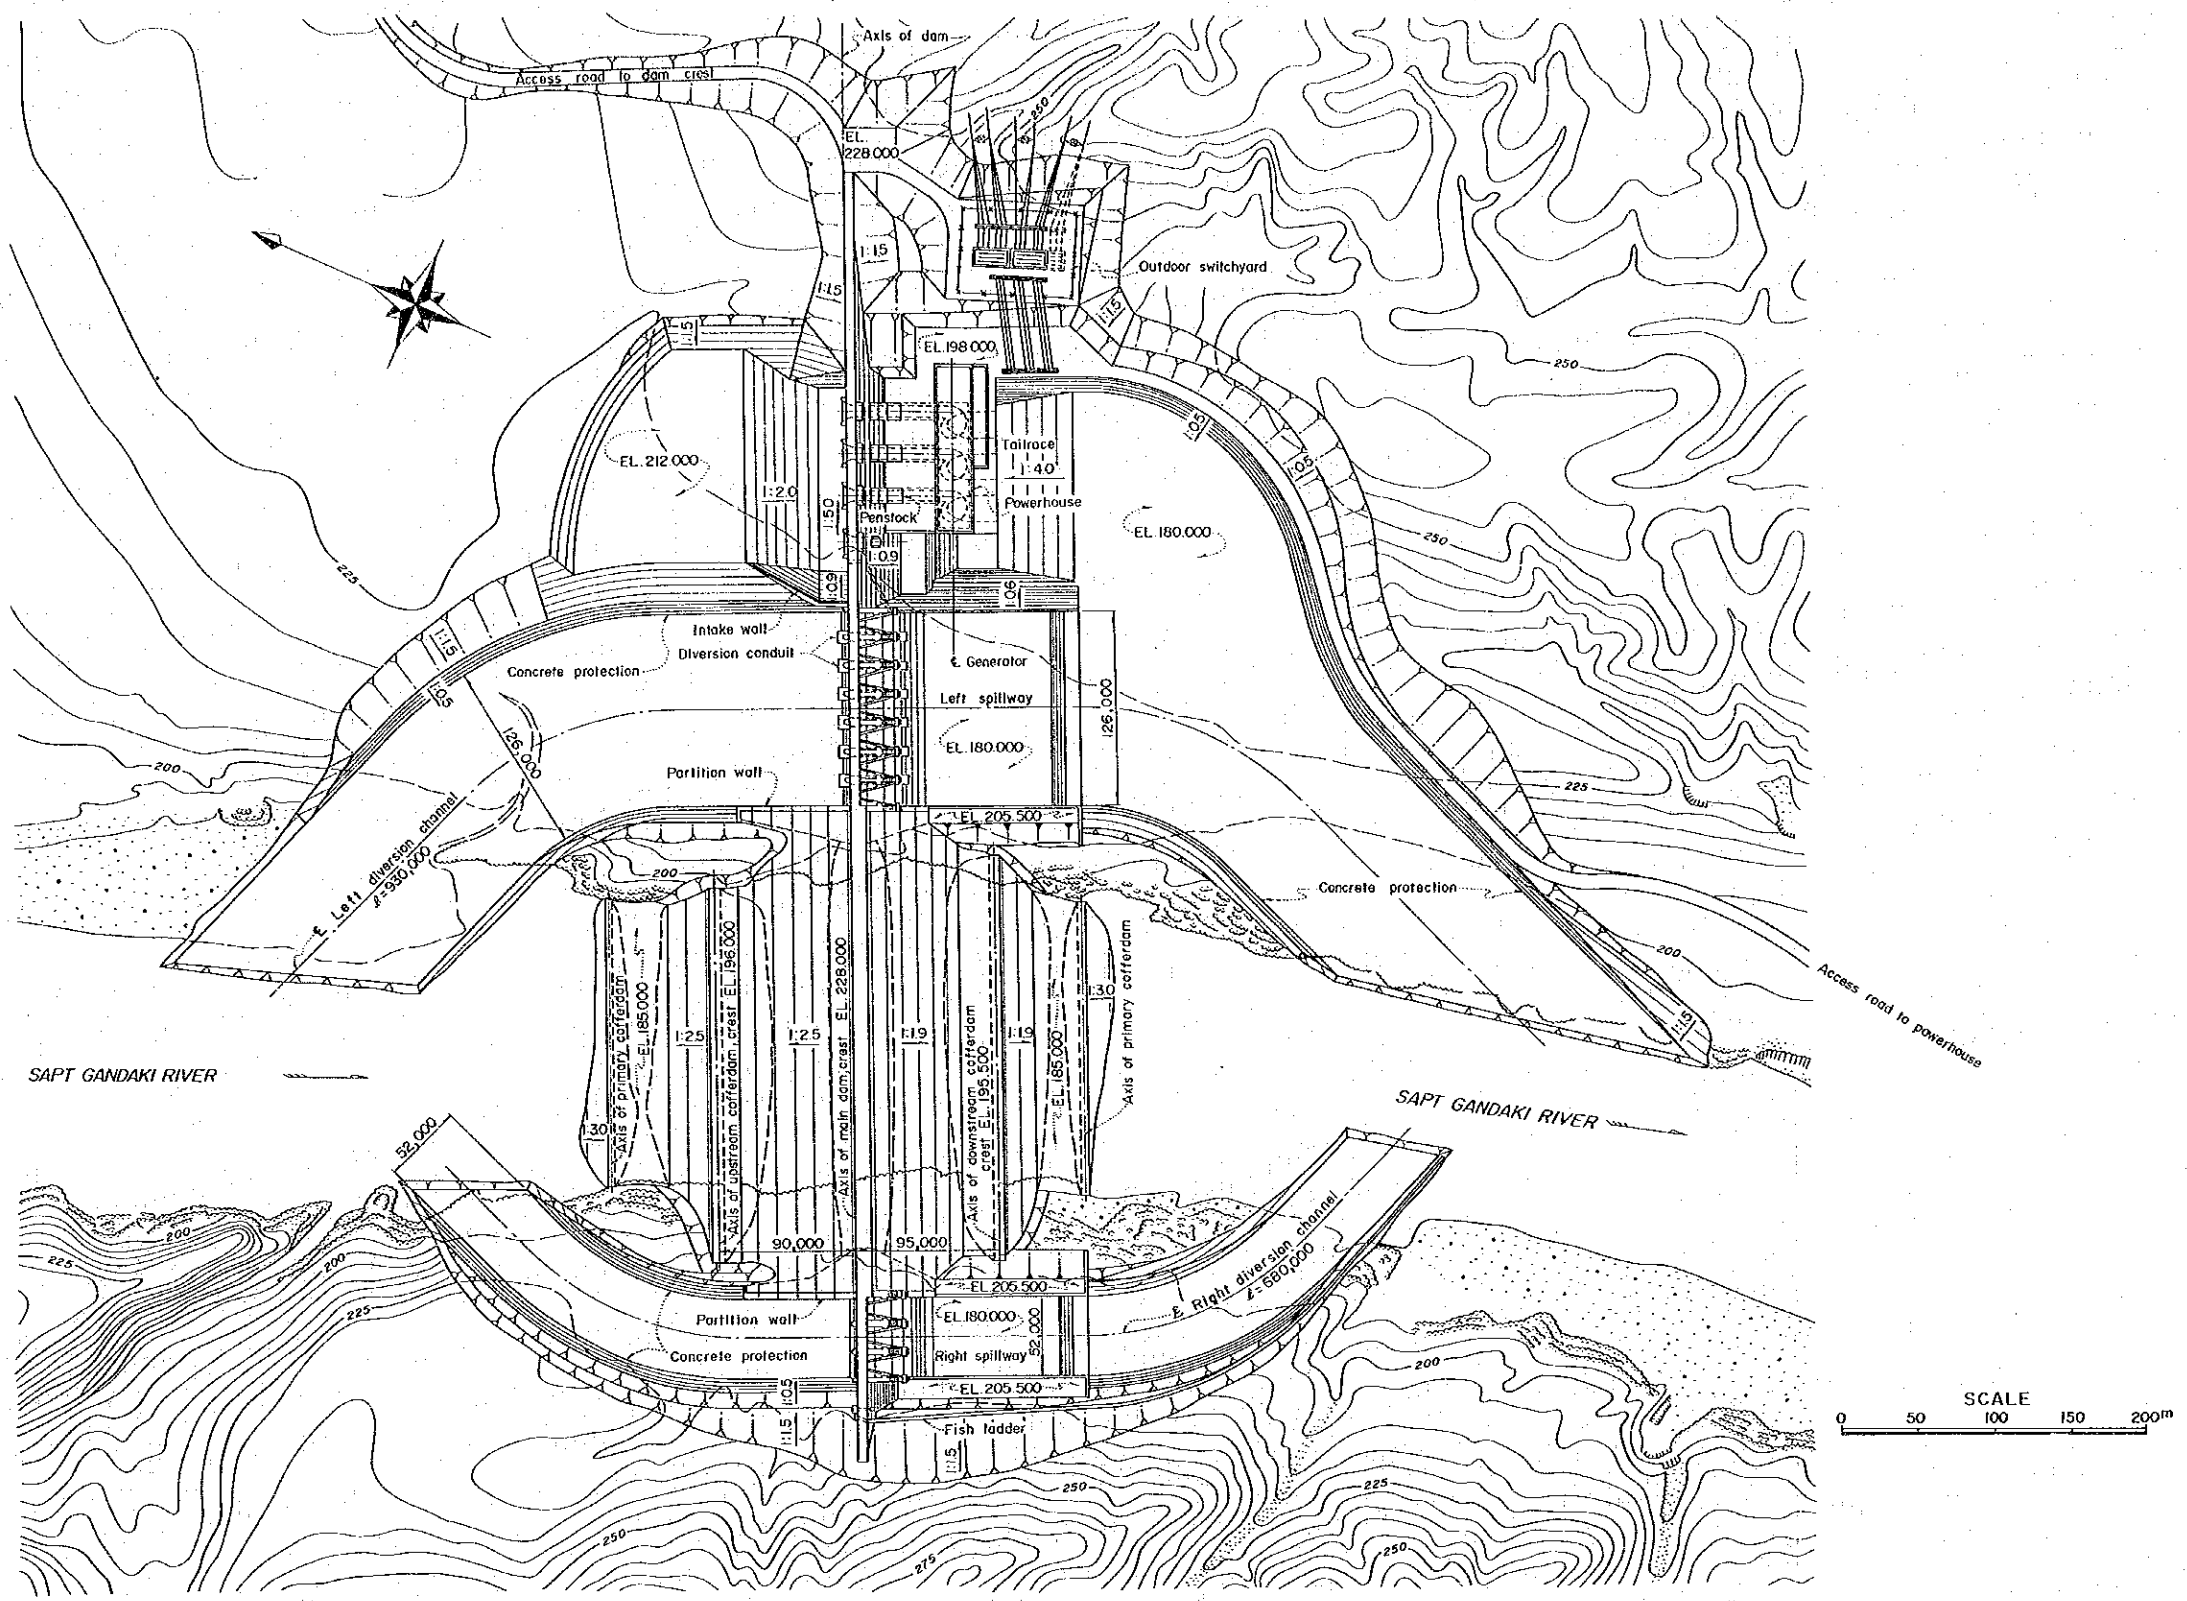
GENERAL PLAN(SCHEME : FILL DAM, DAMSITE-A, F.S.L 220, 150MW INSTALLED CAPACITY)
